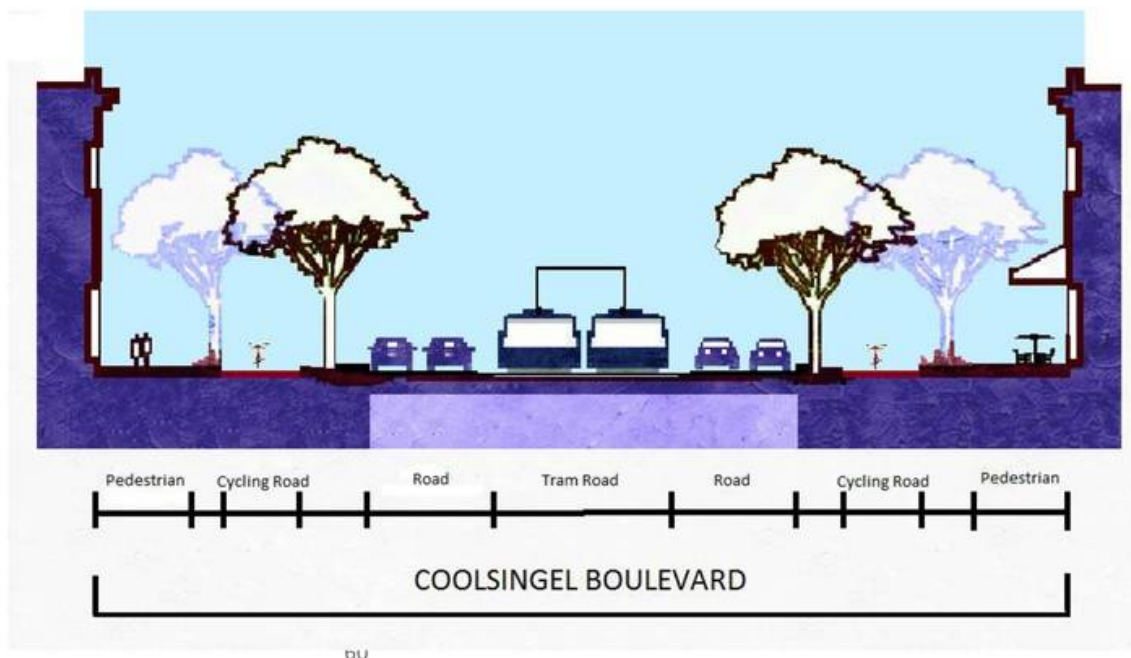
a section plan of Coolsingel Boulevard in the twenty first century. The multifunctional dimension of the boulevard supply for pedestrians, cyclists and tram users (section plan by author).
